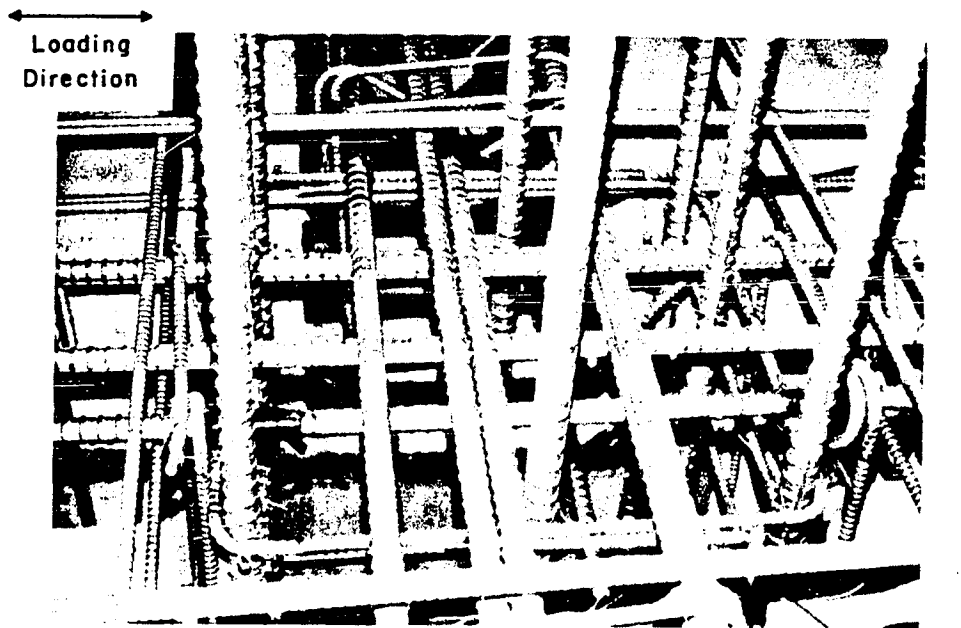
Interior joint reinforcing detail, seven-story structure
